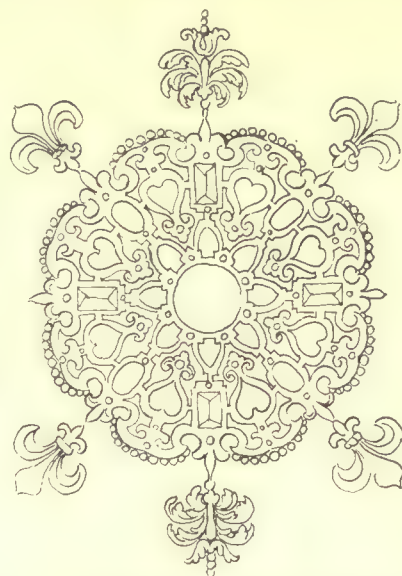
From Gallery Ceiling, Great Campden House, Kensington.
